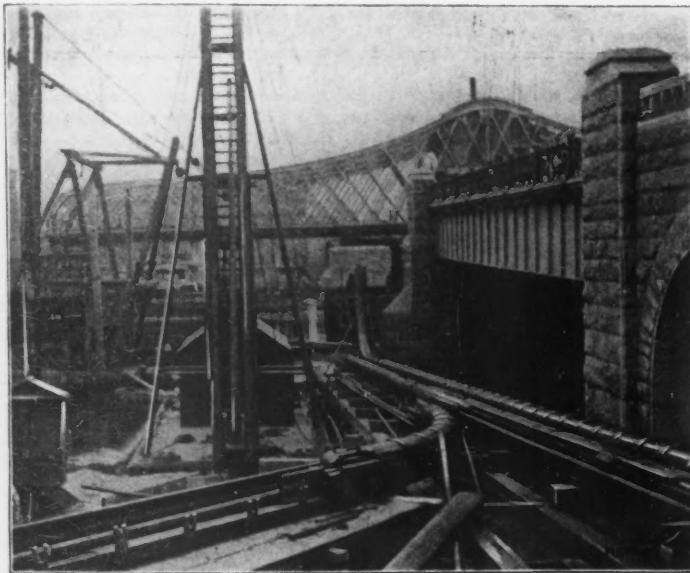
GENERAL VIEW SHOWING SUBWAY IN PROCESS OF CONSTRUCTION, THE LAUNCHING WAYS AND THE THIRD AVENUE BRIDGE.
